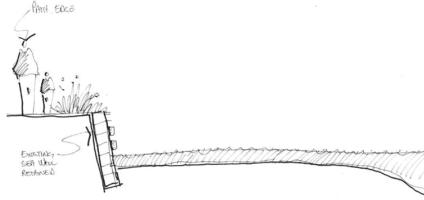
Possible Section AA (Reach 1) Existing Seawall is retained. Small interventions are retrofitted to the wall to encourage cyster and ecology growth.
